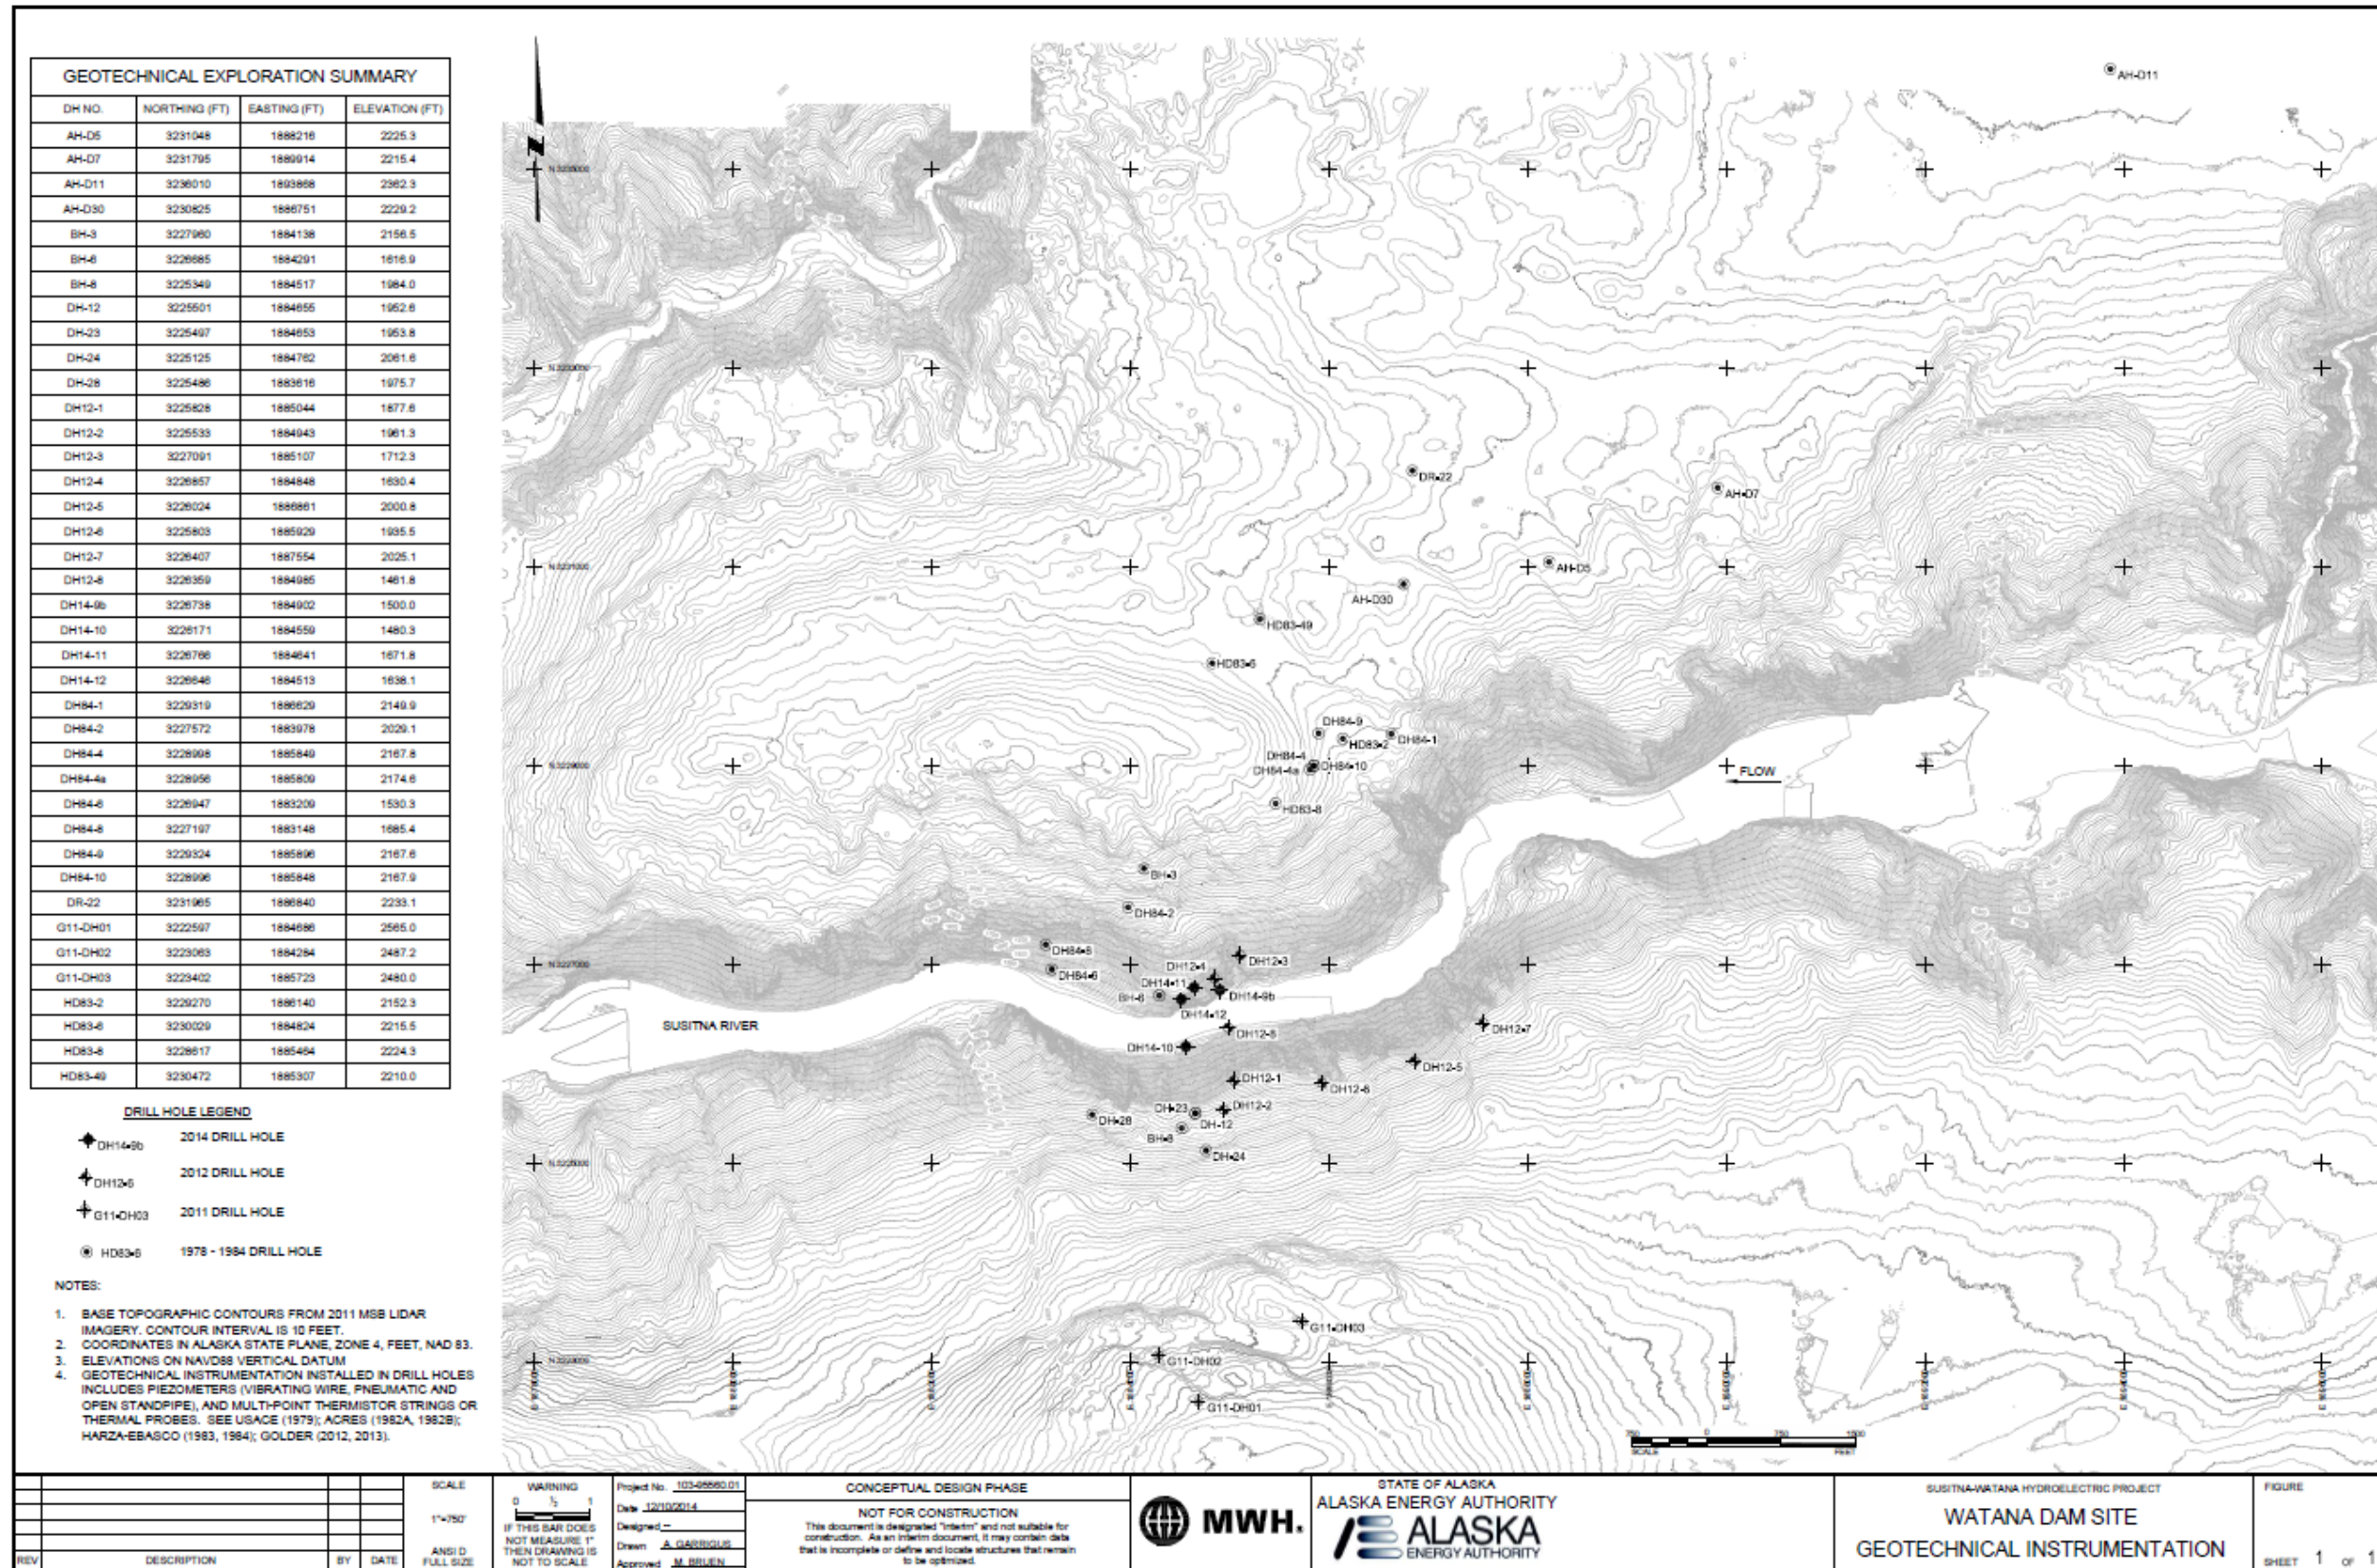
Watana Dam Site Geotechnical Instrumentation
